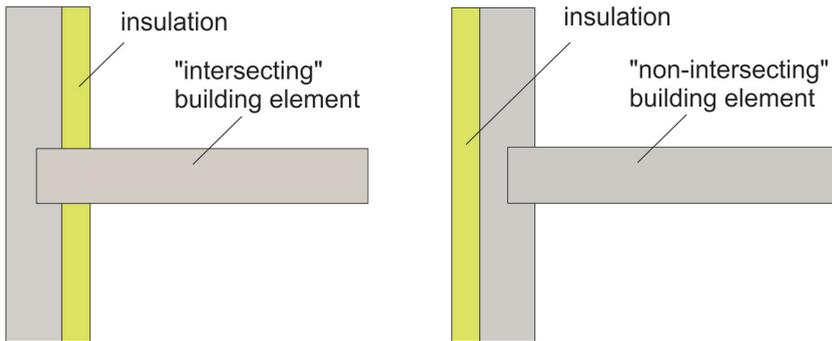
Insulation “intersecting” and “non-intersecting” building elements [1]
